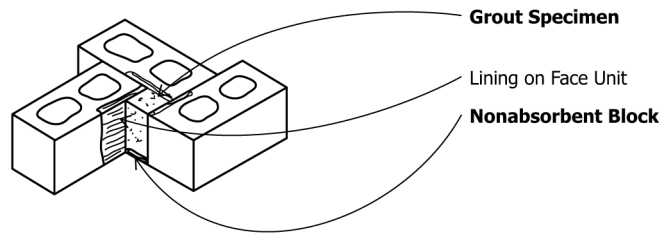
Example of Grout Mold (Units Greater than 6 in. (152.4 mm) High, 8 in. (203.2 mm) High Concrete Masonry Unit Shown)
